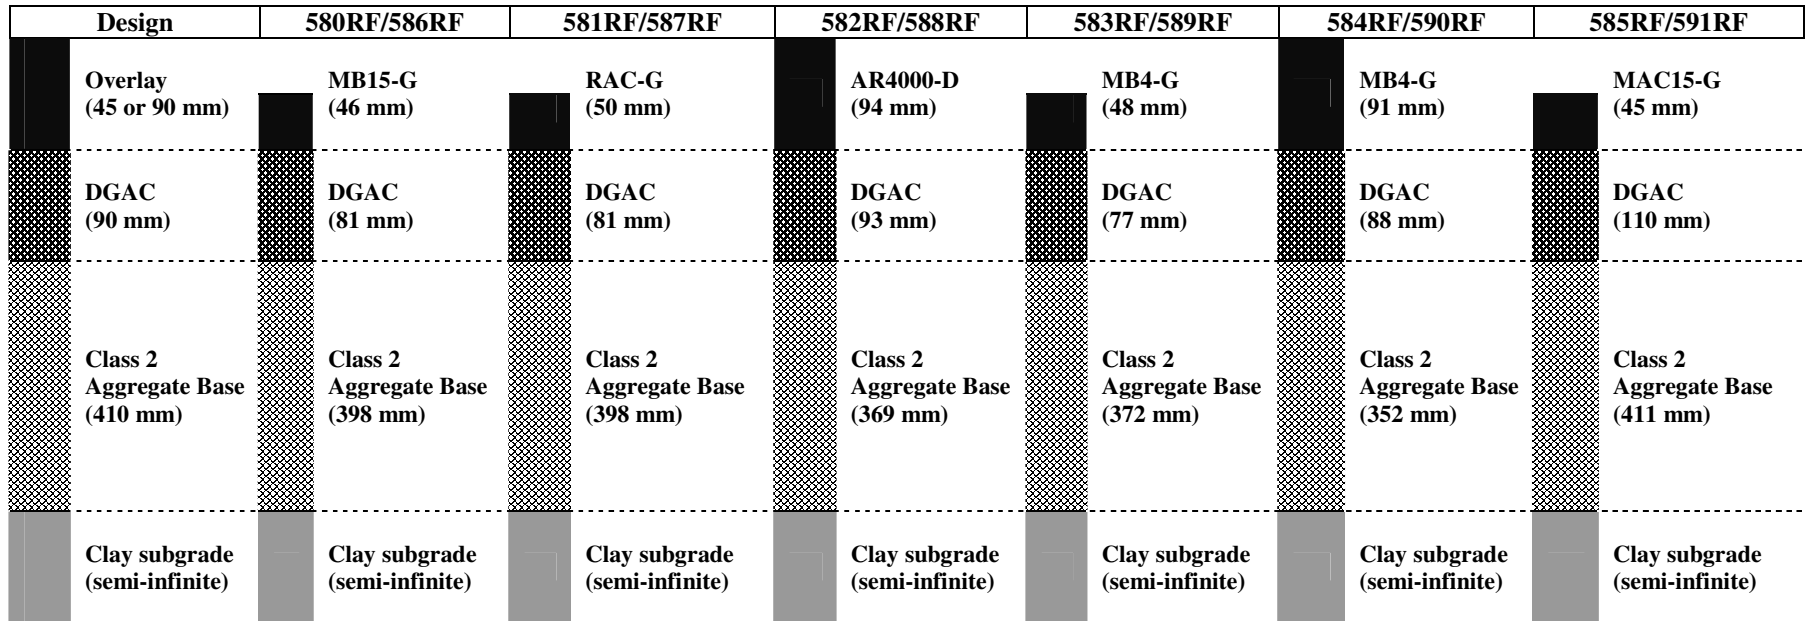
Pavement design for Reflective Cracking Study experiment (design and actual).
